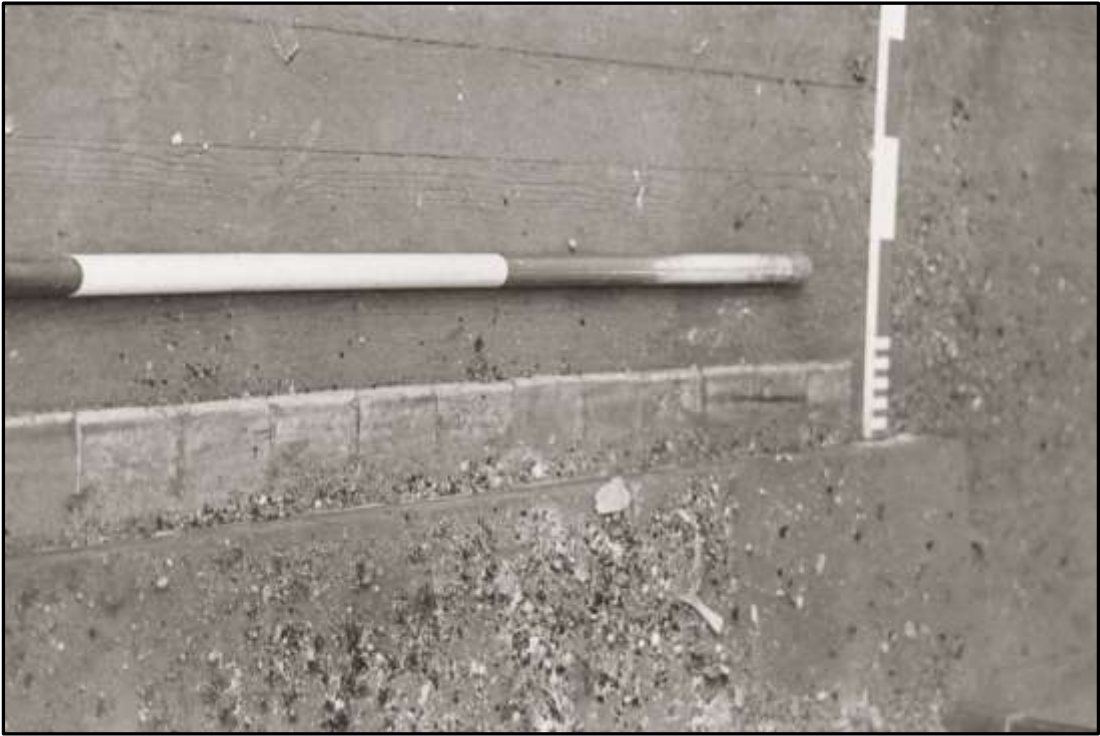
Remains of tiled hearth to renewed first floor fireplace
